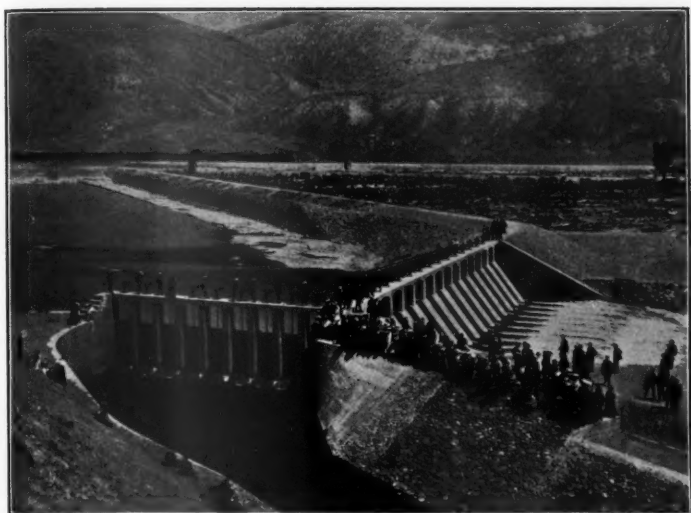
COMPLETED TRUCKEE DAM: CANAL OPENED JUNE 17, 1905.
